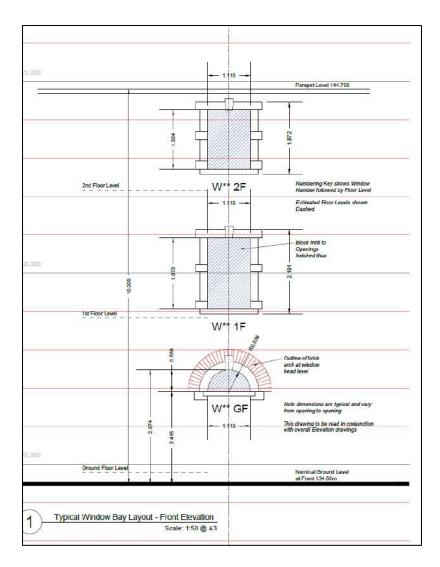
Typical window layout front-north elevation of barracks, Joe Byrne Surveys.
